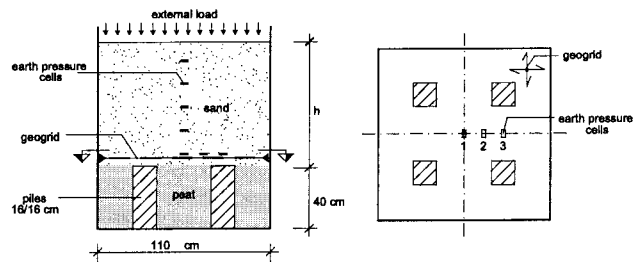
Typical 1:3 scale test arrangement (ZAESKE, 2001)
